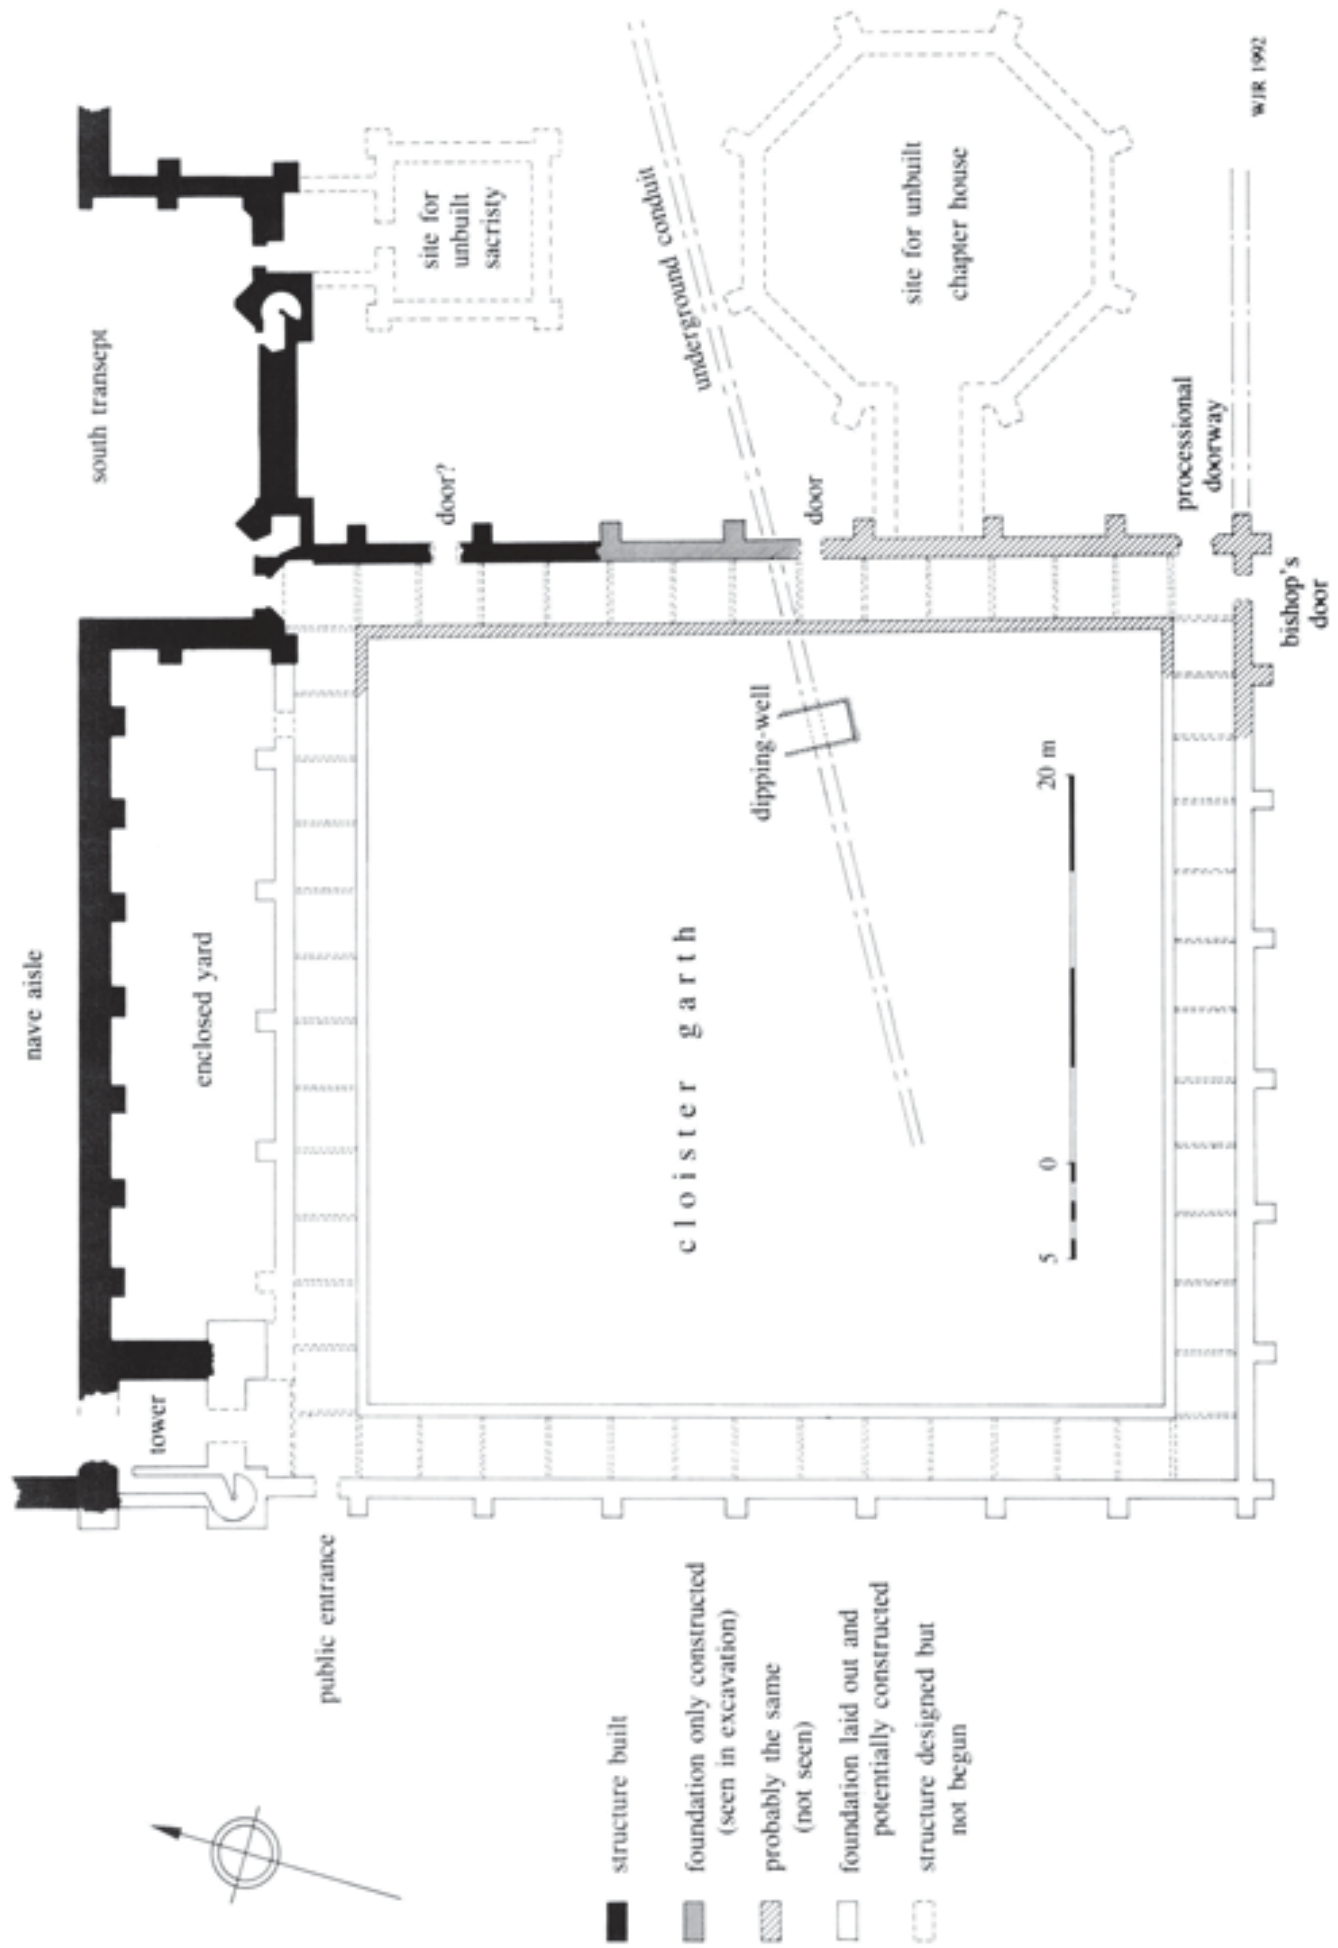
Hypothetical reconstruction of the intended late twelfth-century ground plan of the cloister, chapter house, south-west tower, and south transept sacristy. The extent to which construction is known, or likely, to have occurred is indicated. Scale 1:400
